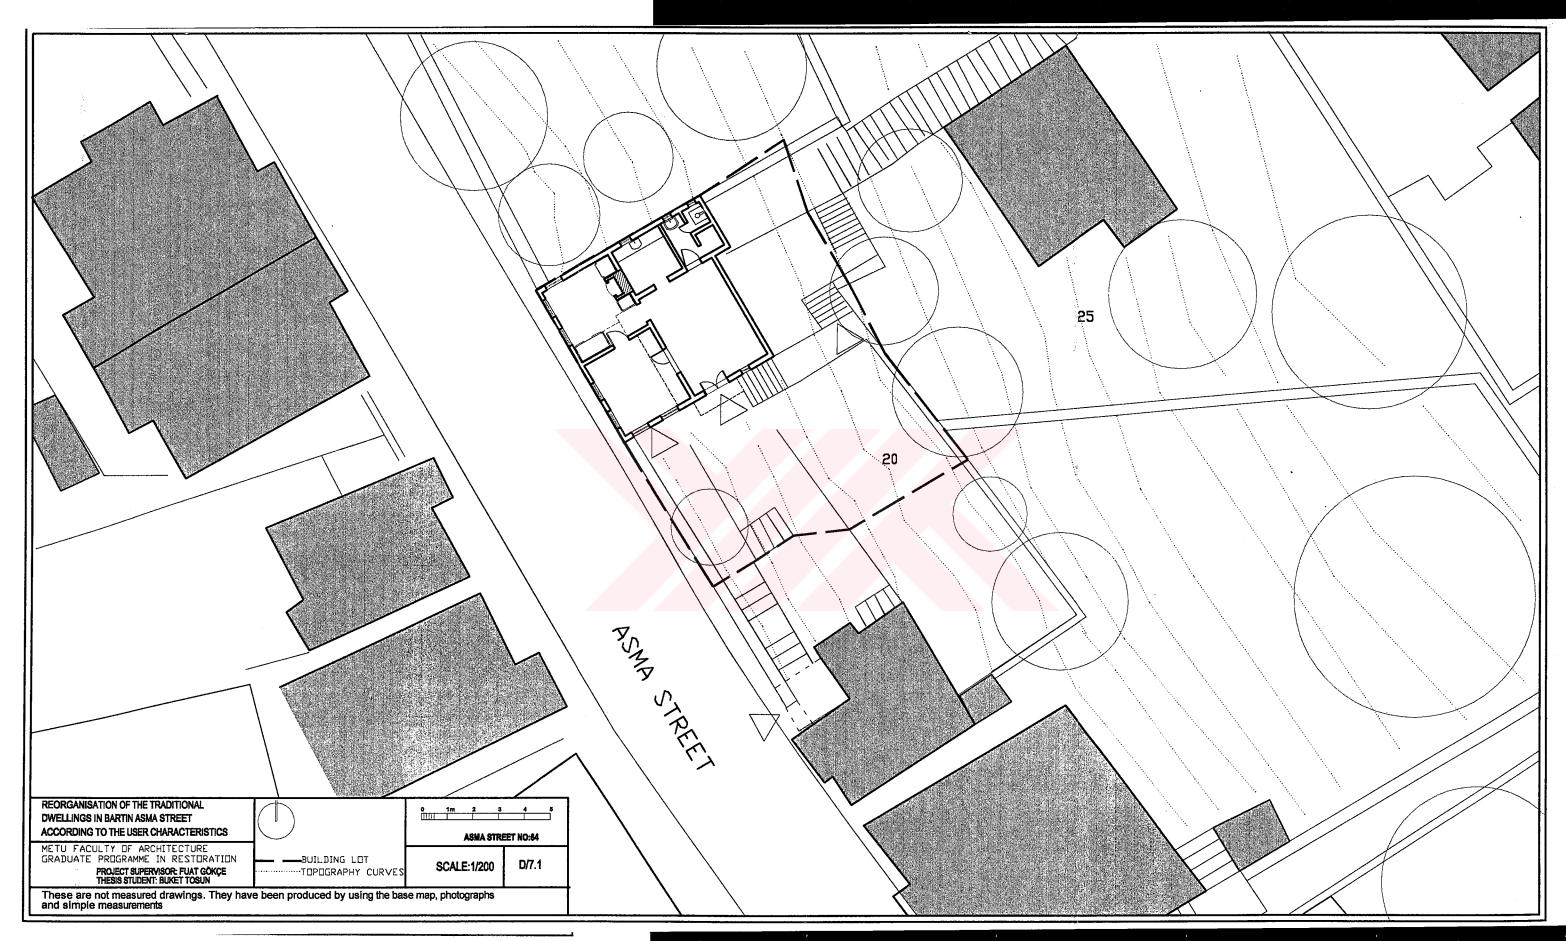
Sketch Brawings of the Building Lot of Building Noi64
